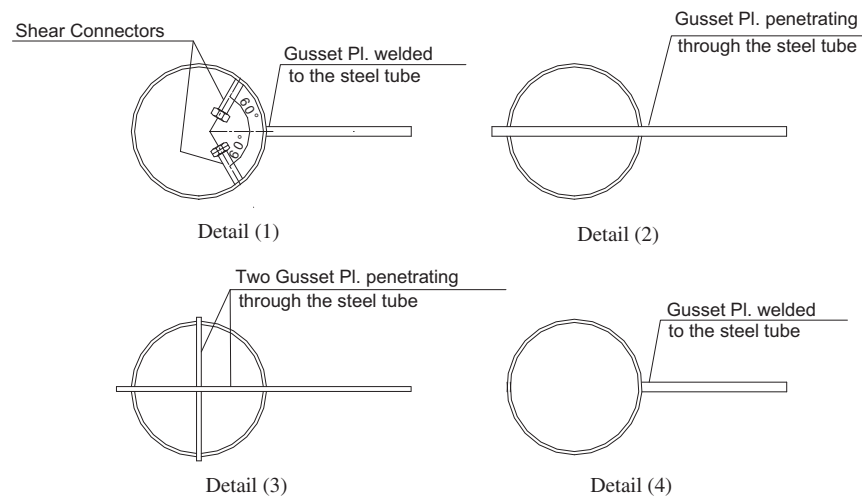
Reproduction of Fig. 1a. Configuration of different studied connection details (Hassan et al., 2013).
